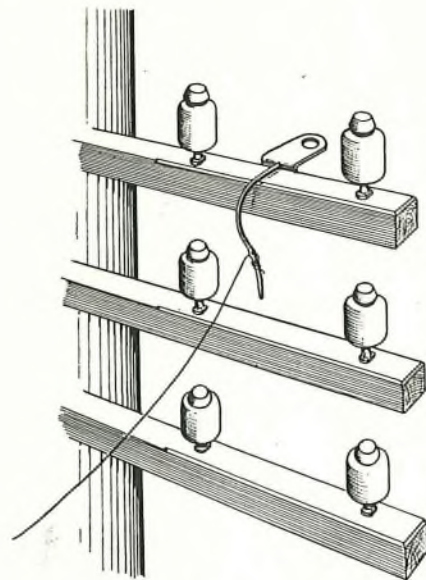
TOOL PLACED IN POSITION ON ARM.
